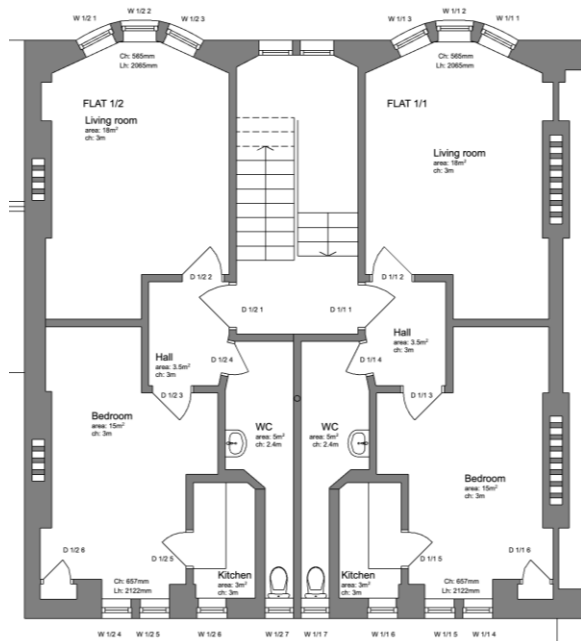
Floor plan of the building. Source: John Gilberts Architects.
